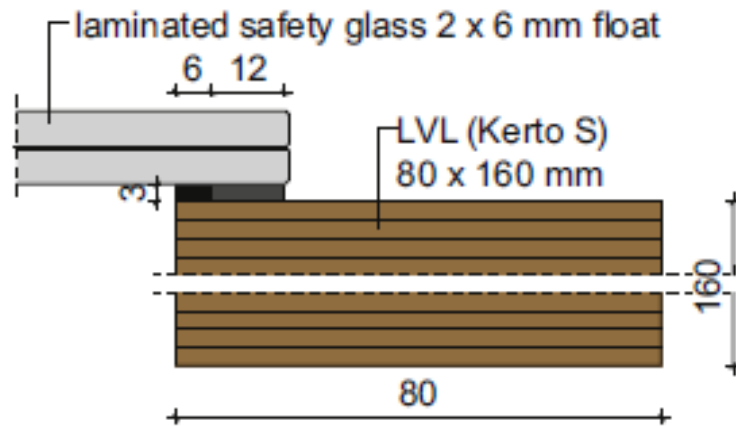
Set up experiment timber glass shear wall detail(Piculin et al. 2016)
